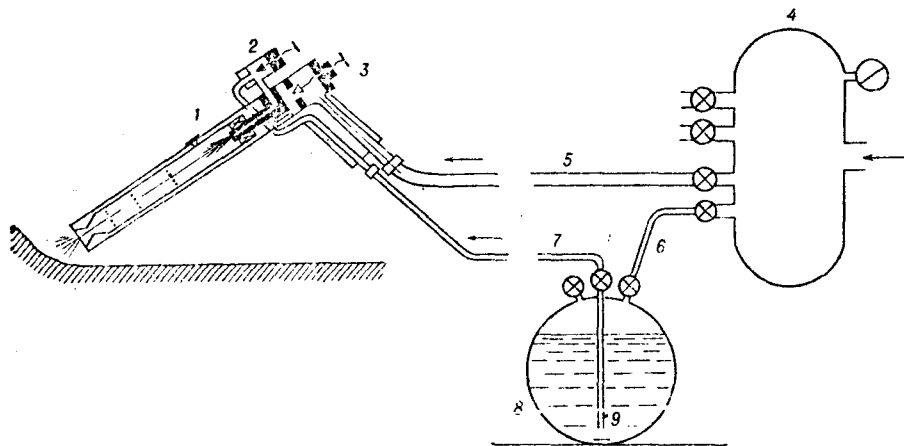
Diagram Showing Air-Jet Device with Gasoline Burner. 1 - thermal cutter; 2 - fuel valve; 3 - air tap; 4 - compressor receiver for main air line; 5 - air hose; 6 - pressure hose; 7 - fuel hose; 8 - fuel tank; and 9 - intake tube.
